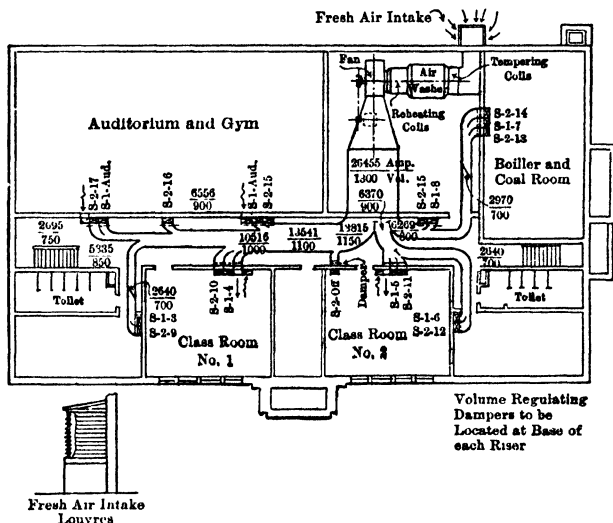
Metal Duct Distribution. Typical School Layout. Basement Plan.
